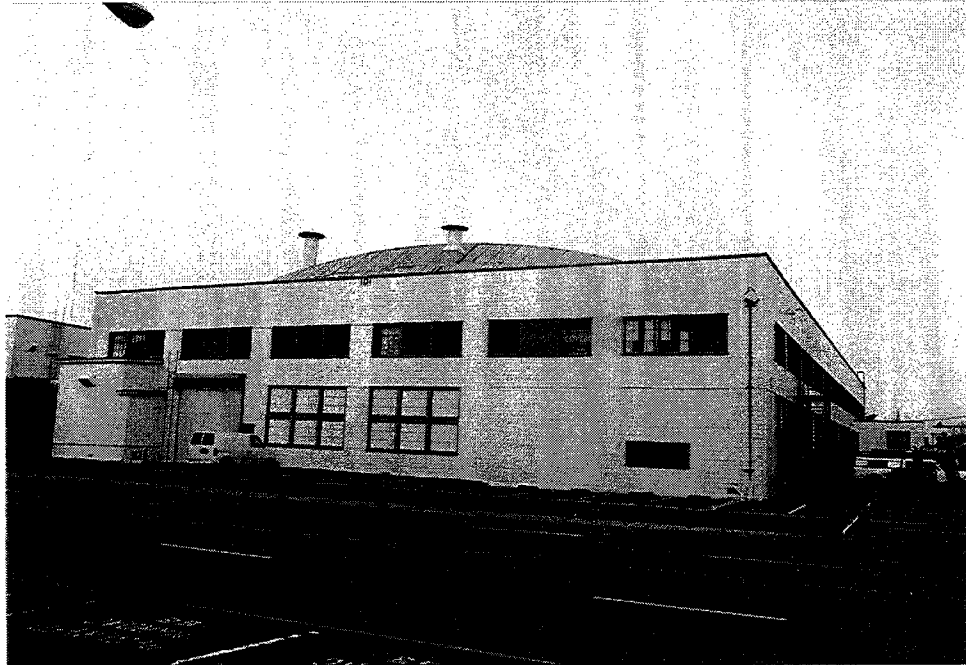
East sides of Buildings 91 and 92, wood frame warehouses.
